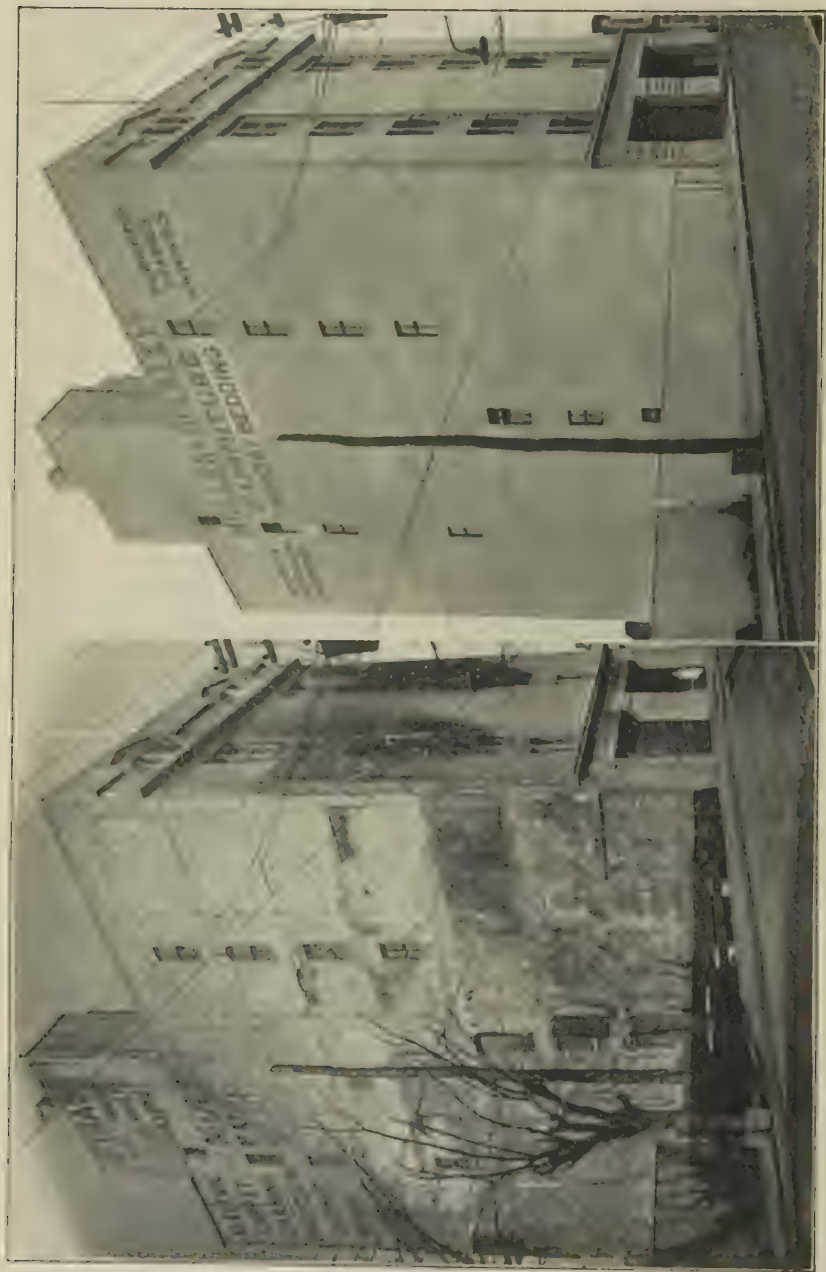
VIEW, LOOKING NORTHWEST, OF MULLEN AND BUCKLEY WAREHOUSE, BEFORE (A) AND AFTER (B) RESTORATION.
